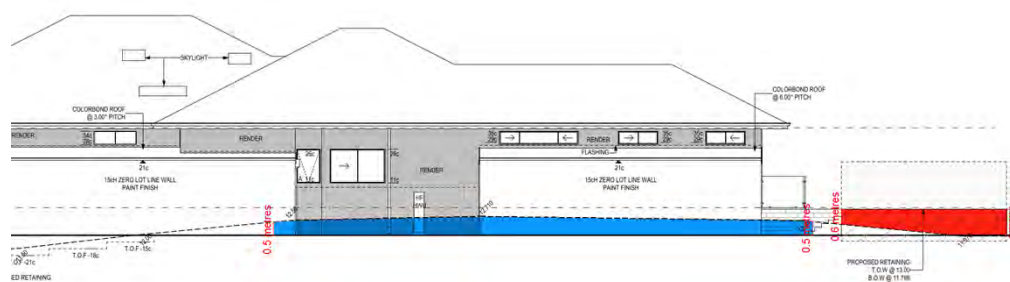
south elevation of excavation greater than 0.5m in blue, 0.5m retaining/infill in red.
